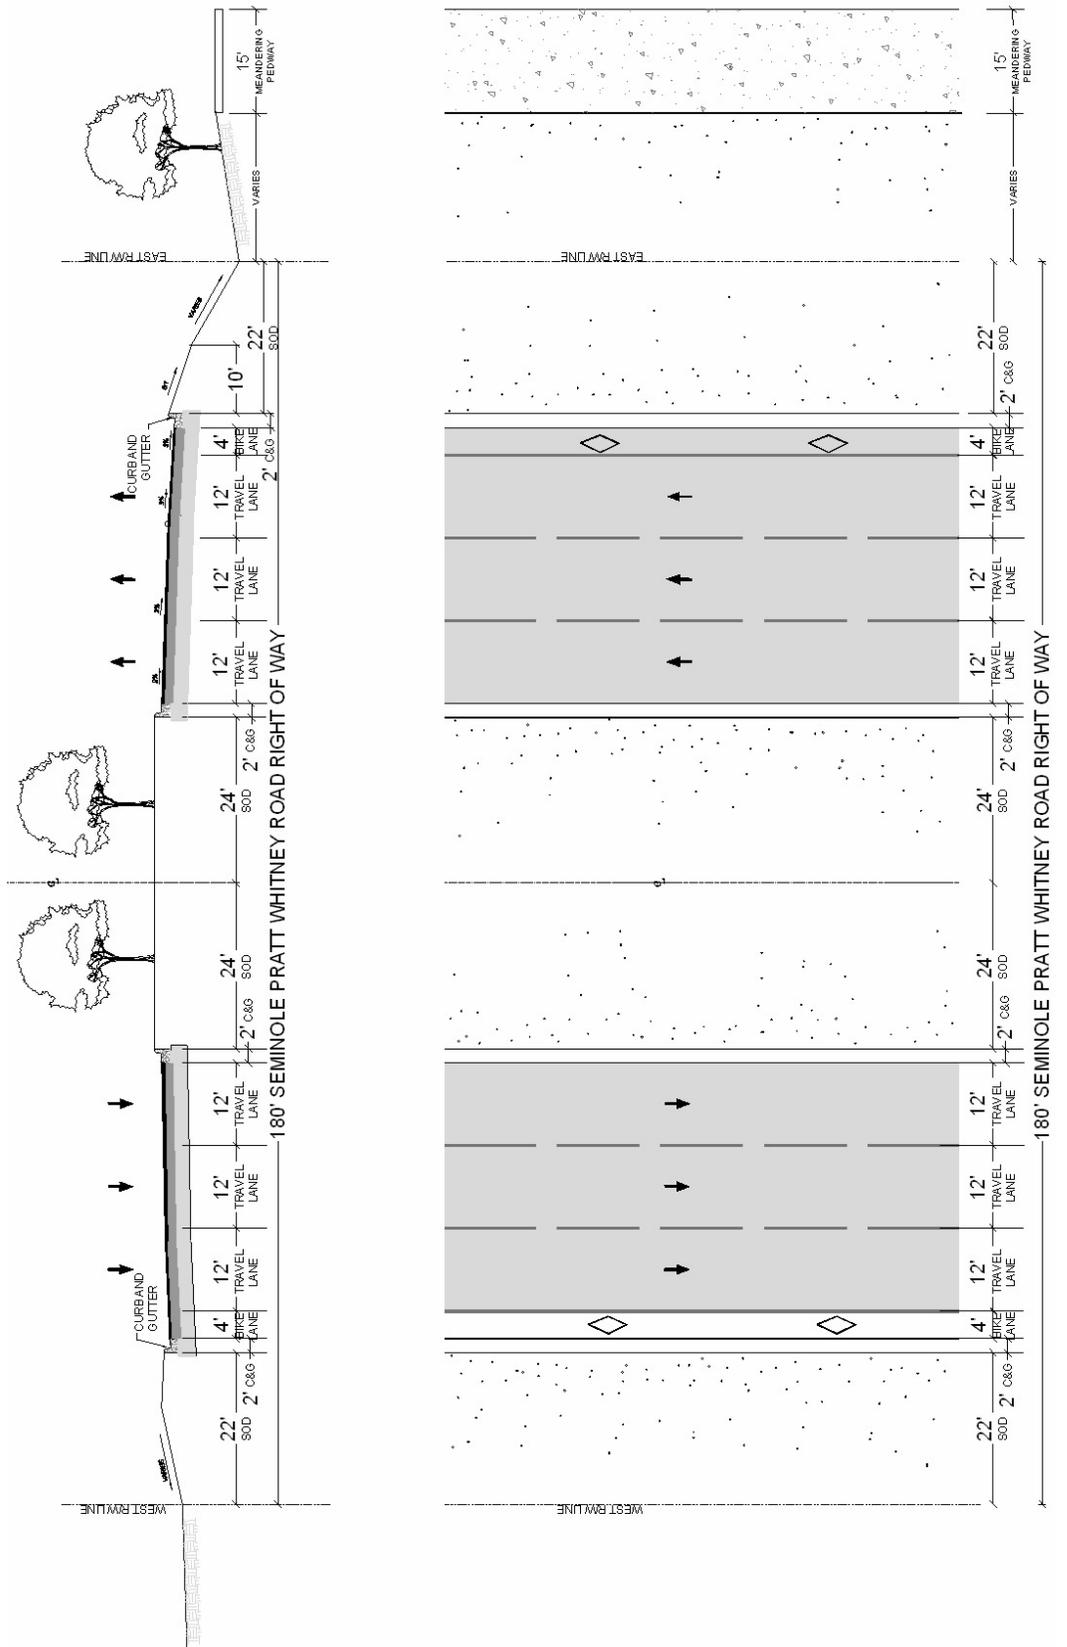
Seminole Pratt Whitney Road 180' Right-of-Way Cross-Section
